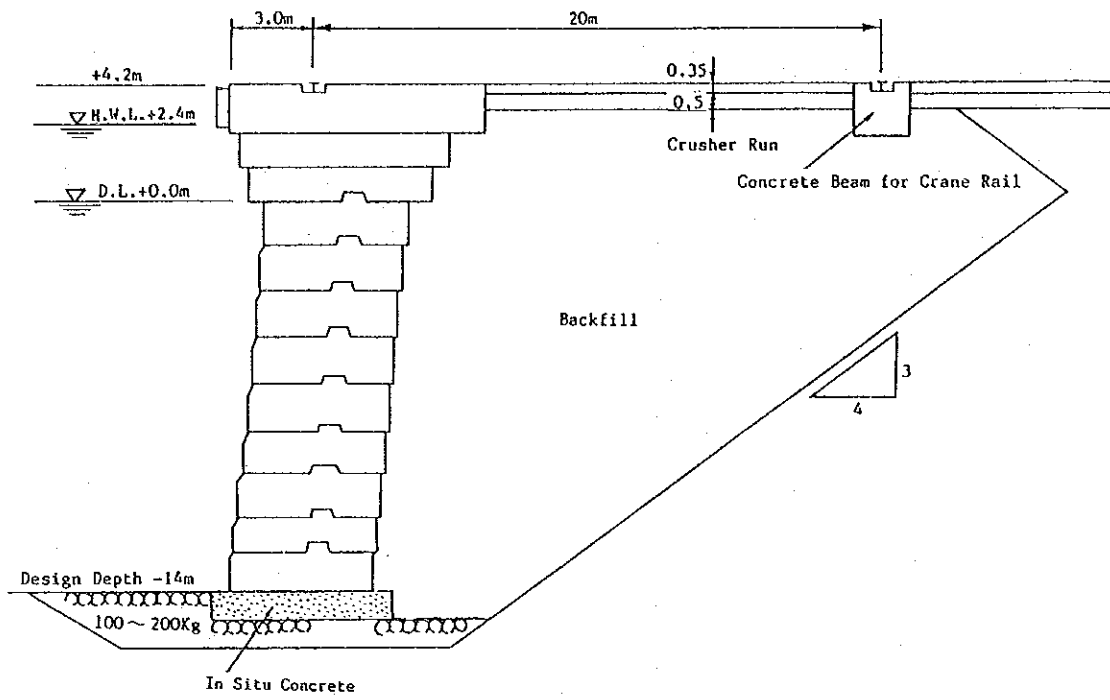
Proposed Cross Section of the Bank (-14m)
